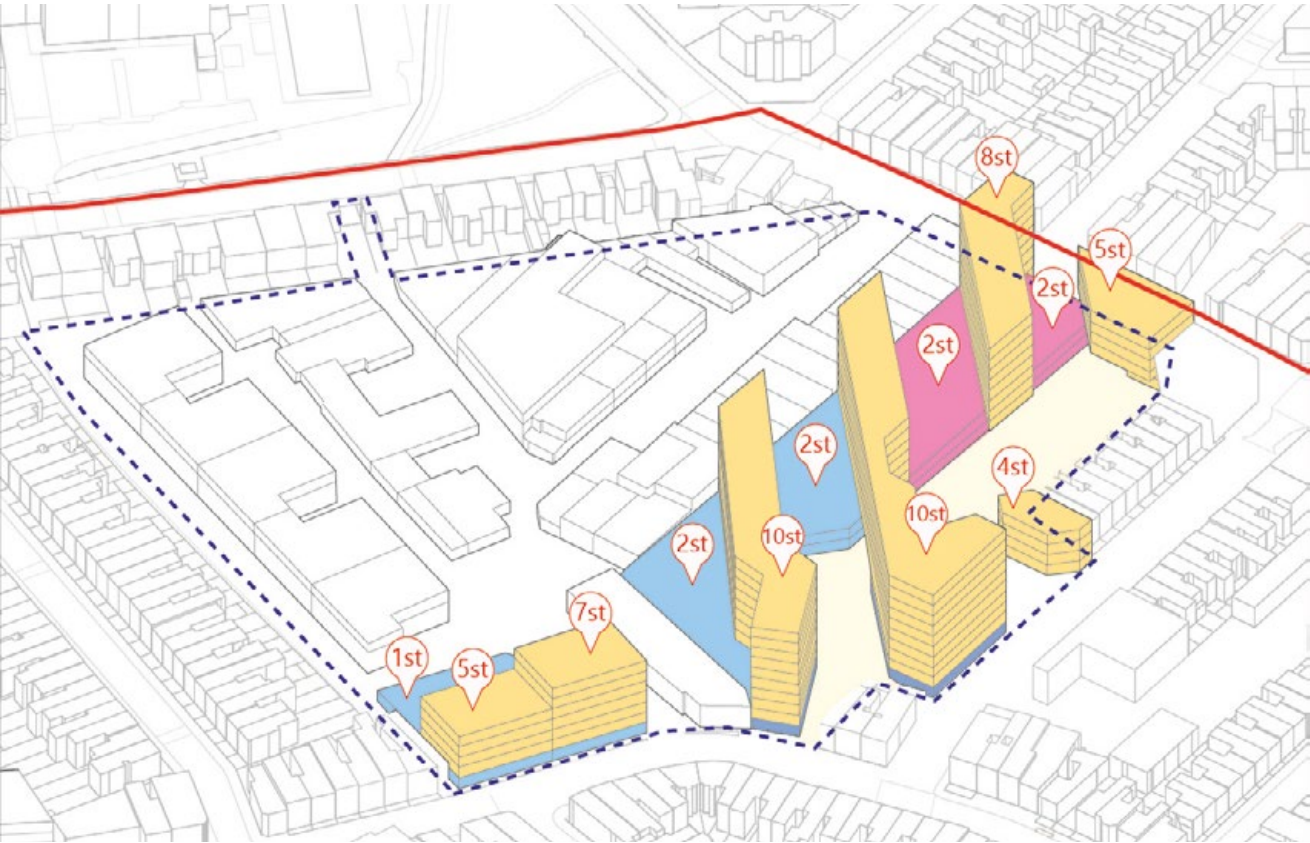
Proposed Massing BSSA4 indicating 1-10 storeys (3m-30m). Hawkins\Brown Masterplan Report
